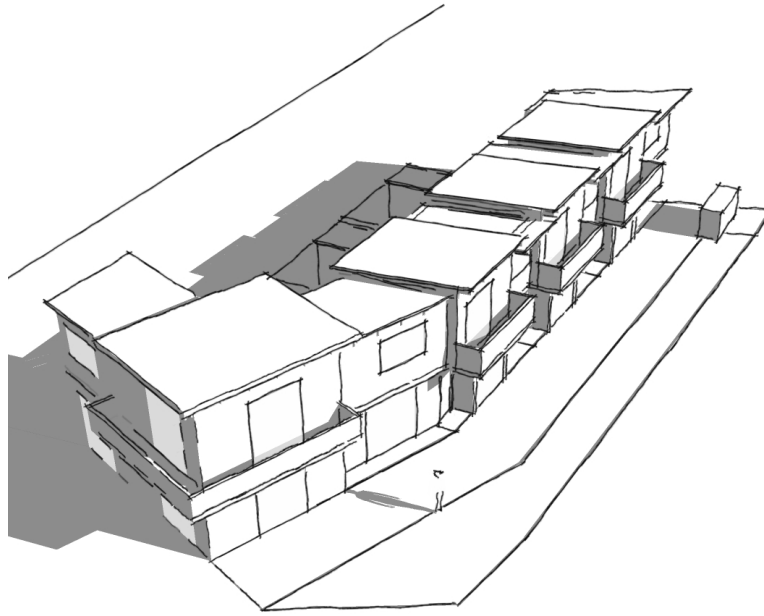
Work Live Units sketch, by Babett Frehrking and Jonker Barnes Architects.
